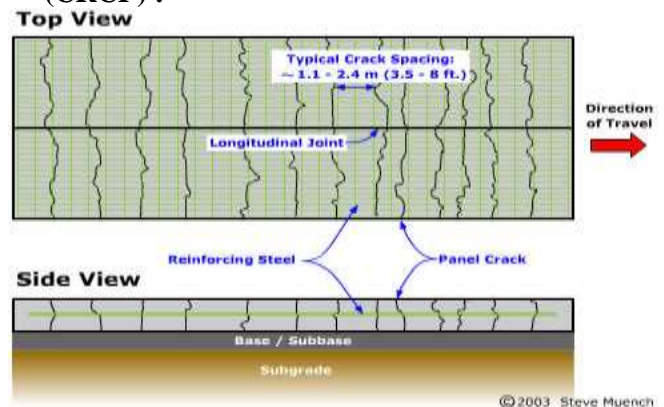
Continuously reinforced concrete pavement (CRCP)
